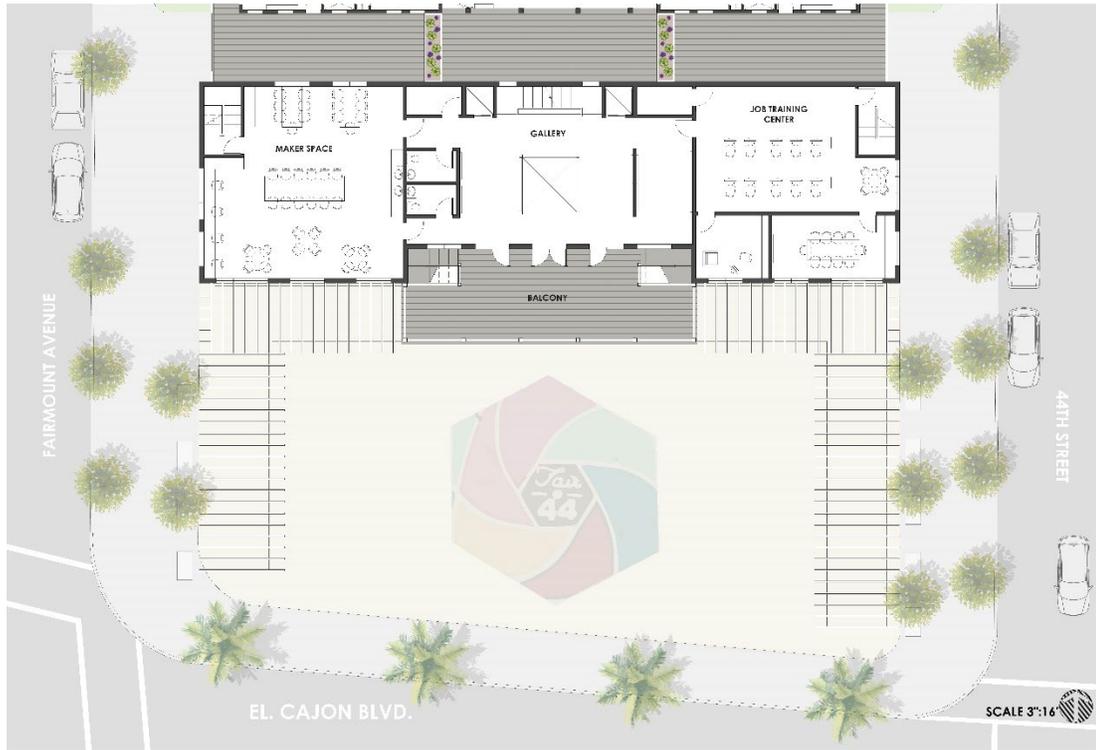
Cultural Center 2nd Floor Plan (Source: Author)
